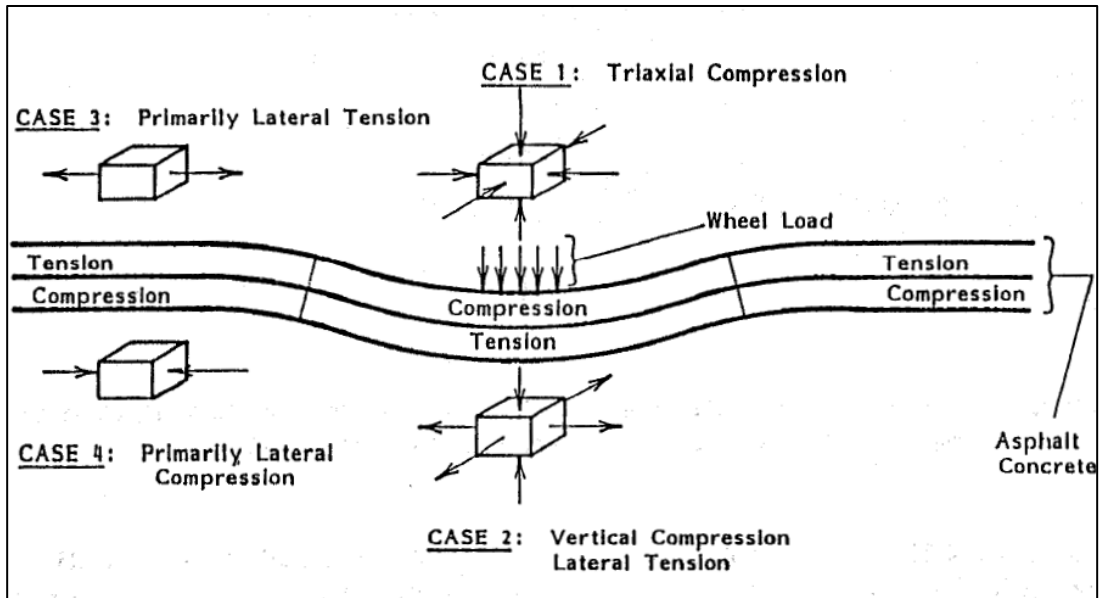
Stress States in an Asphalt Concrete Layer under a Wheel Load
